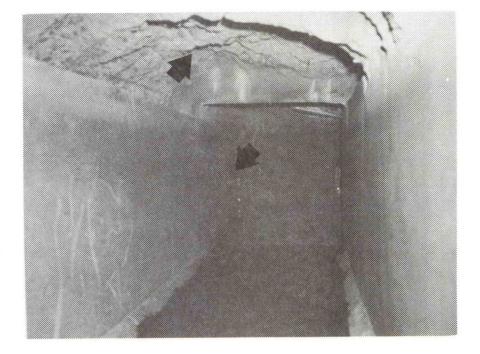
Collection gallery at 90[°] turn shows steel baffle plate and rough concrete ceiling at Little Goose Dam.
